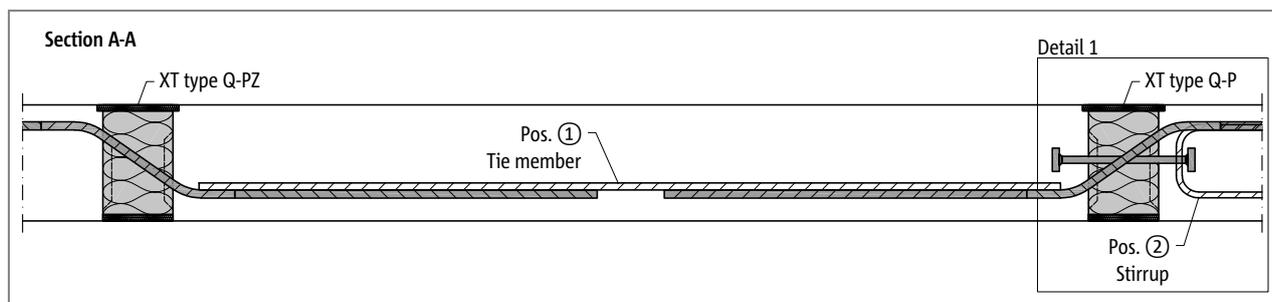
Schöck Isokorb® XT type Q-P, Q-PZ: Detail 1; Reinforcement connection tie member
